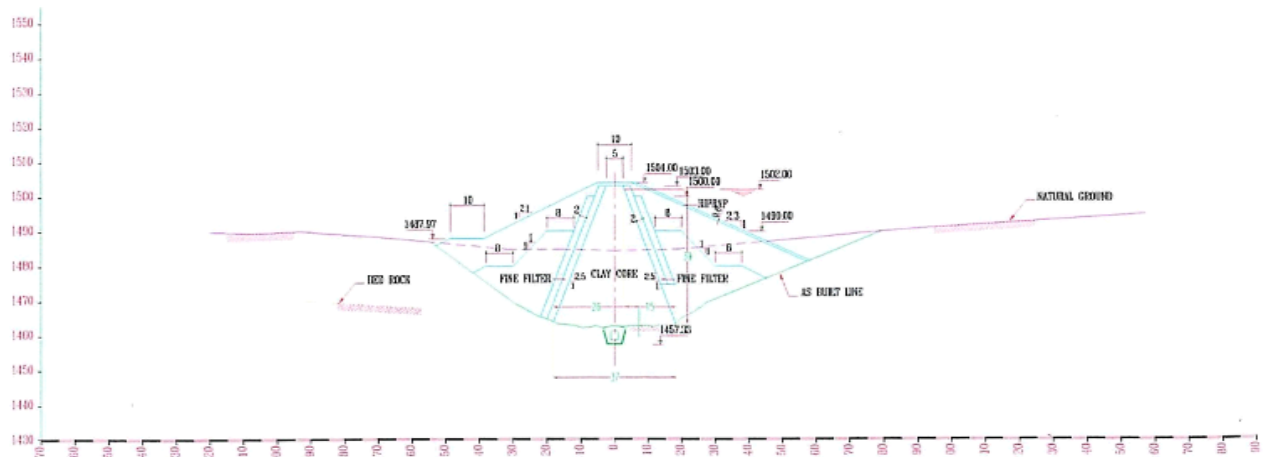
Cross-section of the dam layers below foundation at the right abutment (section 53)
